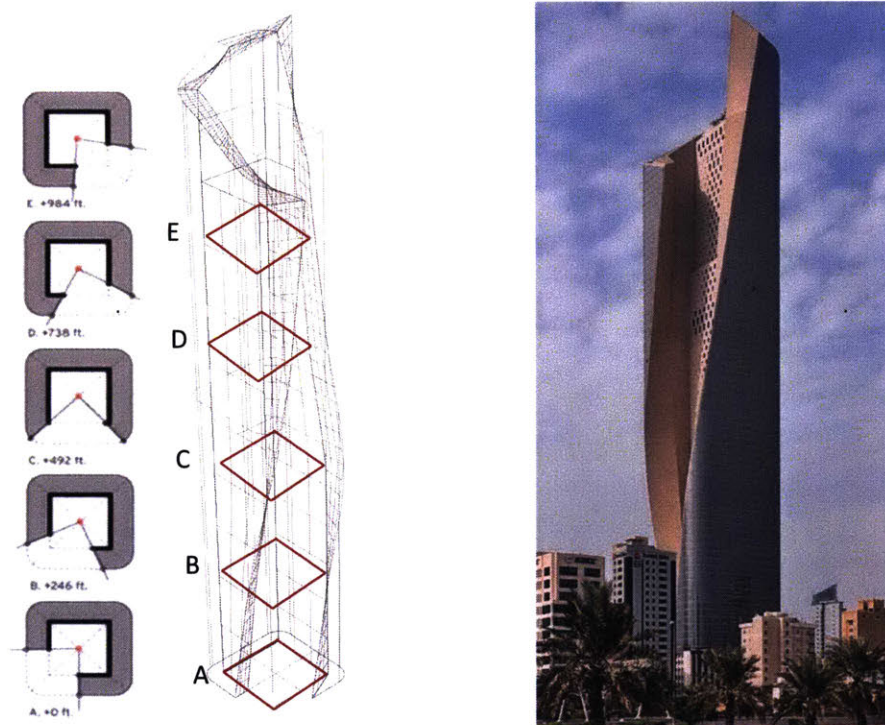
Al-Hamra tower floor plan and design. Modified after Haney G., 2012
